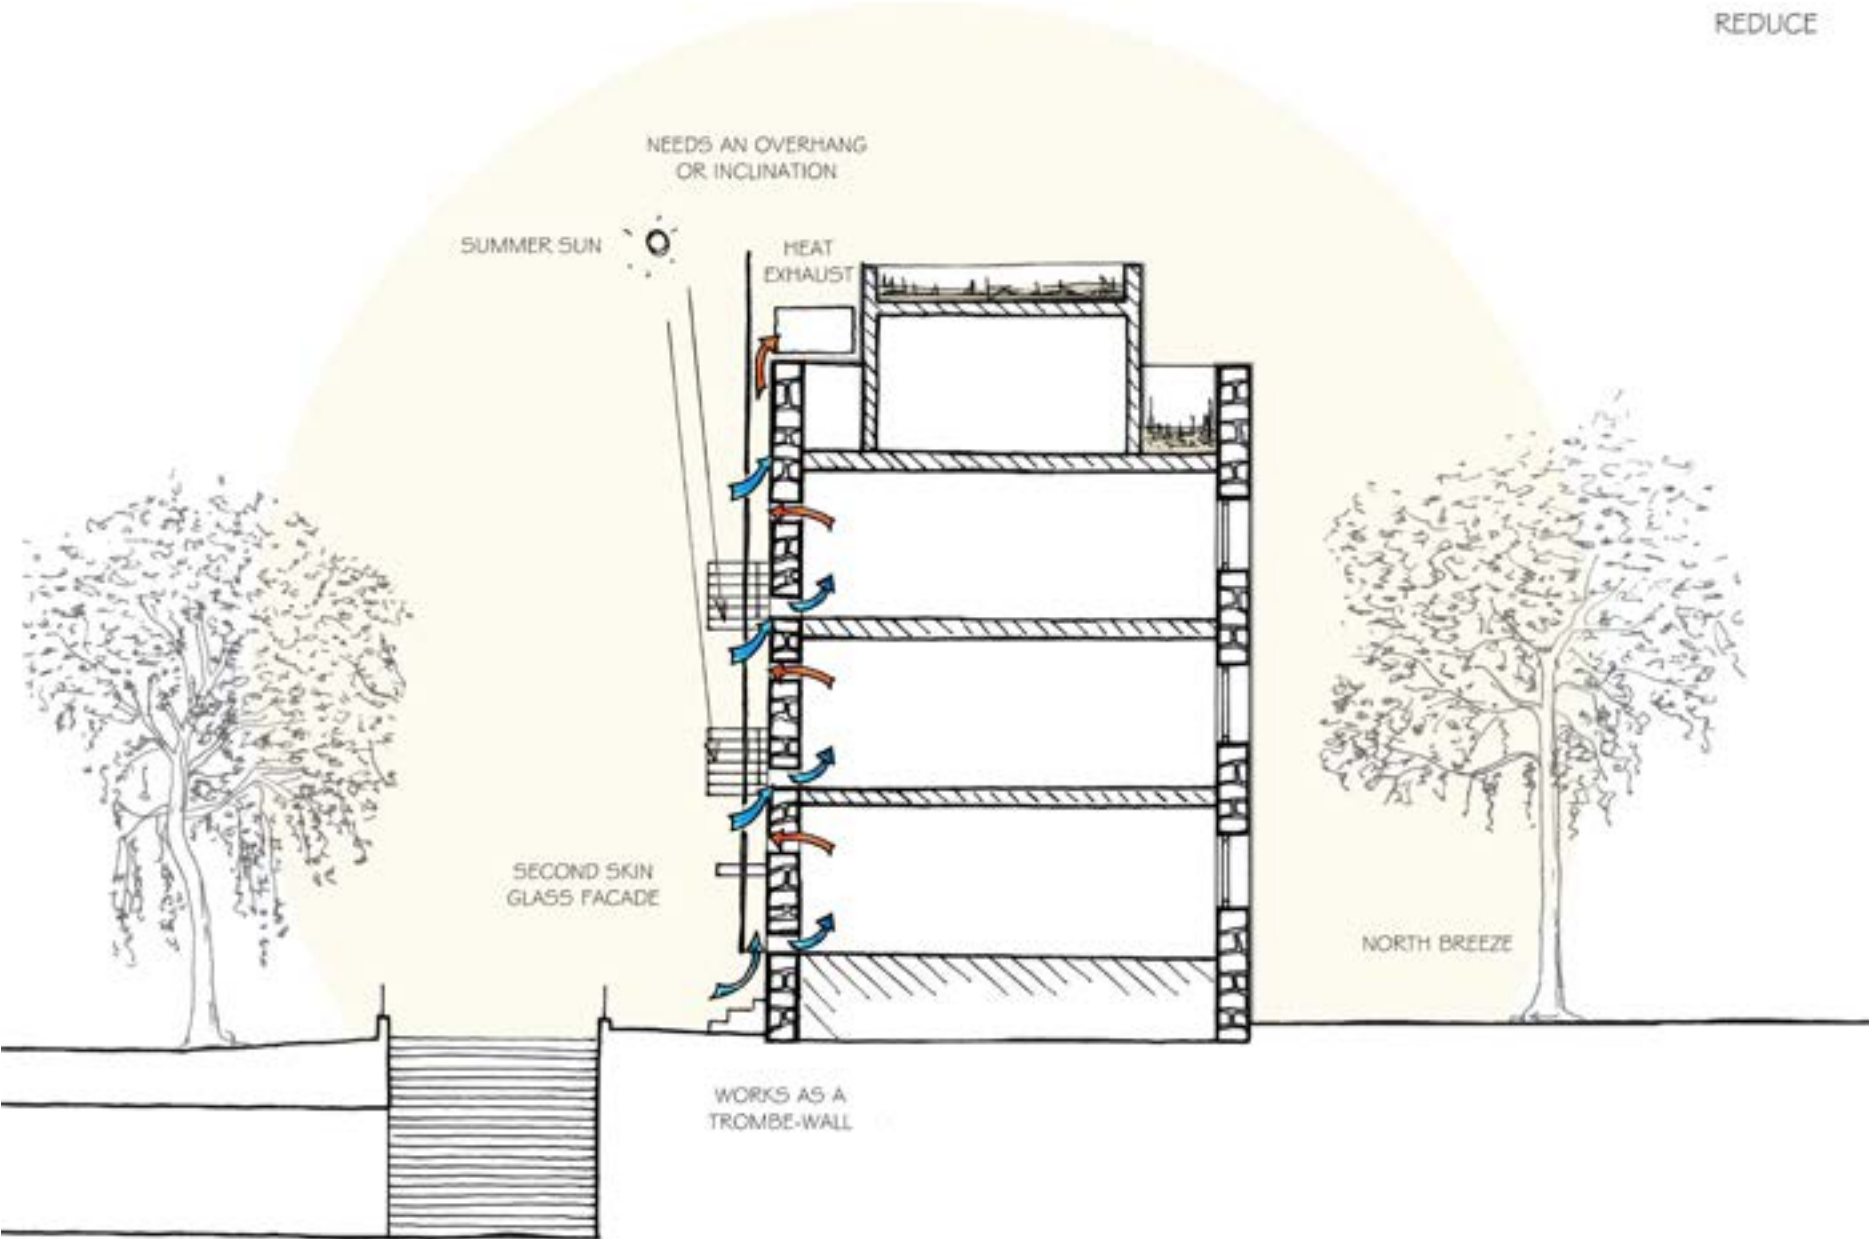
Author (2022). Section of the first building of Prosfygika - Reduce (second skin facade, summer) [Sketch].
